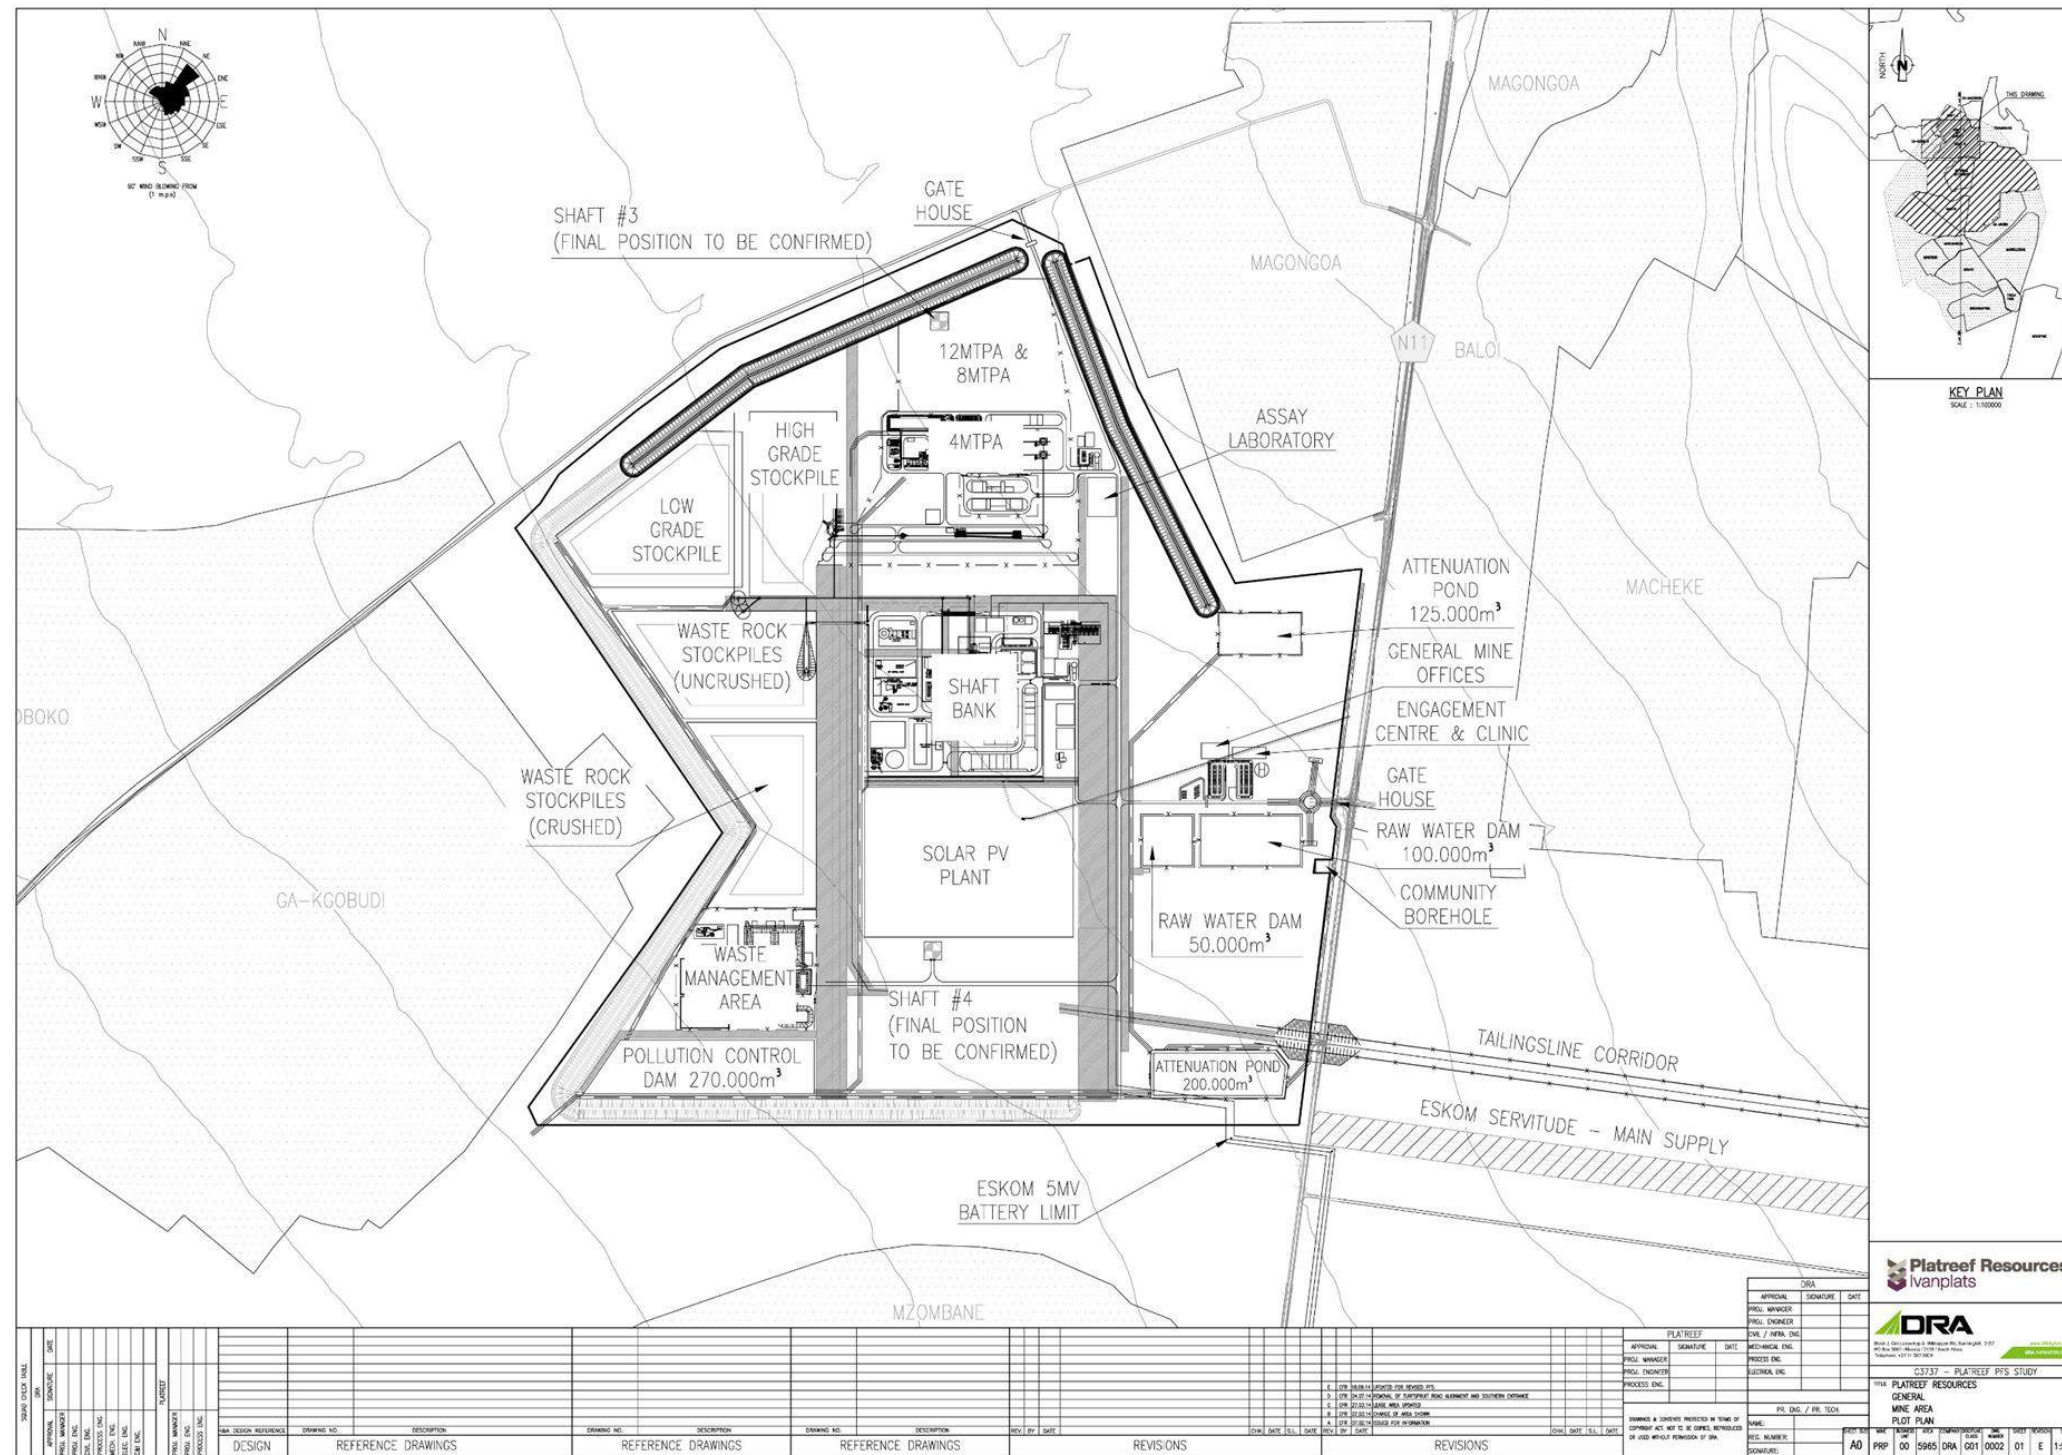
Platreef Mining Area and Rietfontein TSF Plot Plan
